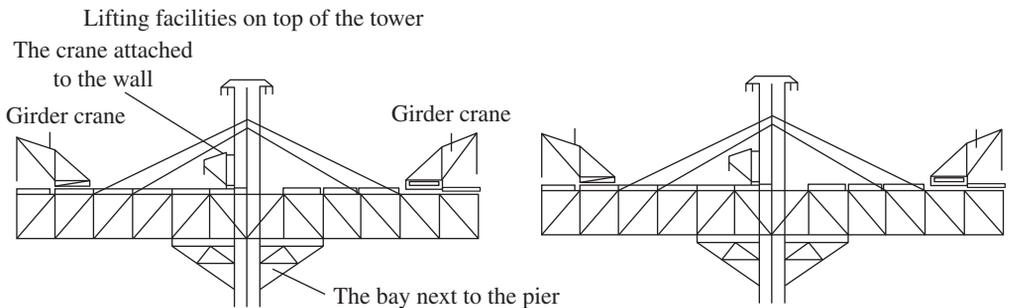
Steel girder erection. (From Zhou, M. B., *Bridge Construction*, (2): 14–19 (in Chinese), 2000a.)
